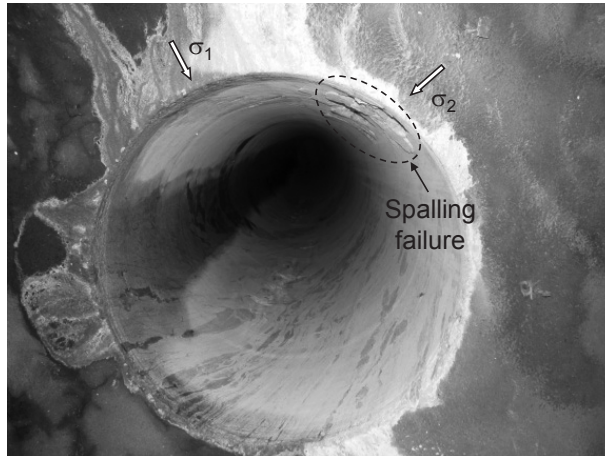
Garpenberg mine raise showing spalling failure and orientation of principal stresses (Edelbro, 2008).
